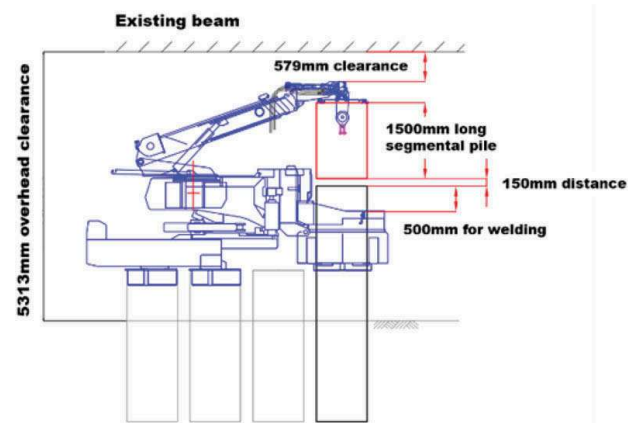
Allowable pile length beneath the beam at pier P2 (5.3m clearance).
